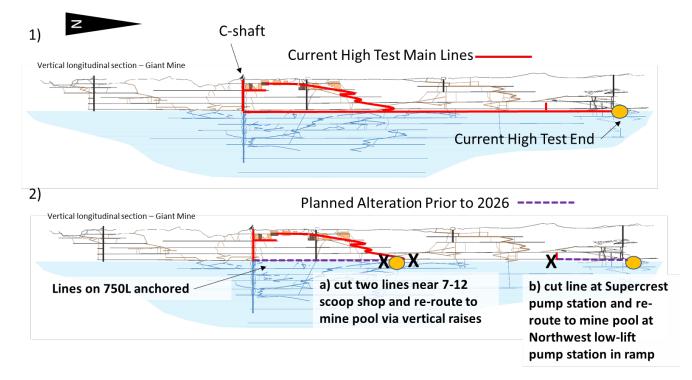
Vertical Longitudinal Section of Giant Mine Looking West Showing: 1) Current Main High Test System Path and 2) of Planned Alteration
